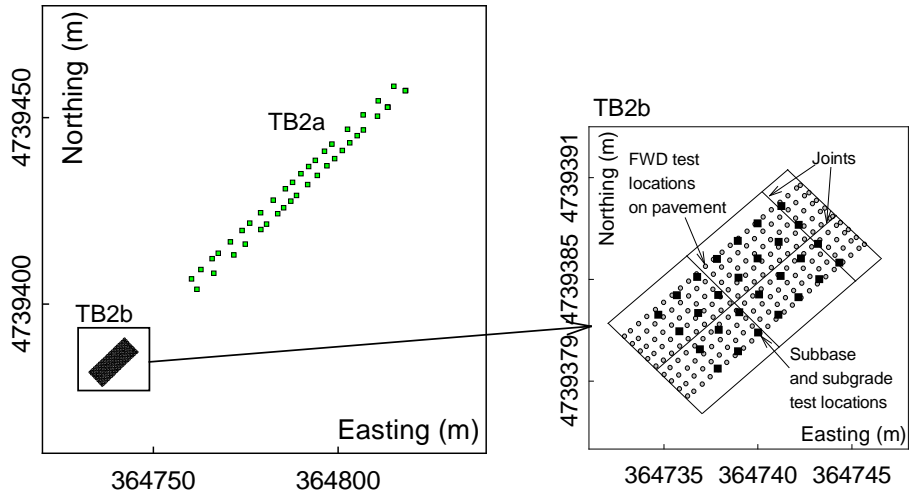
TS2: Plan view showing in situ test locations (left) and detailed view of TS2-B (right)
